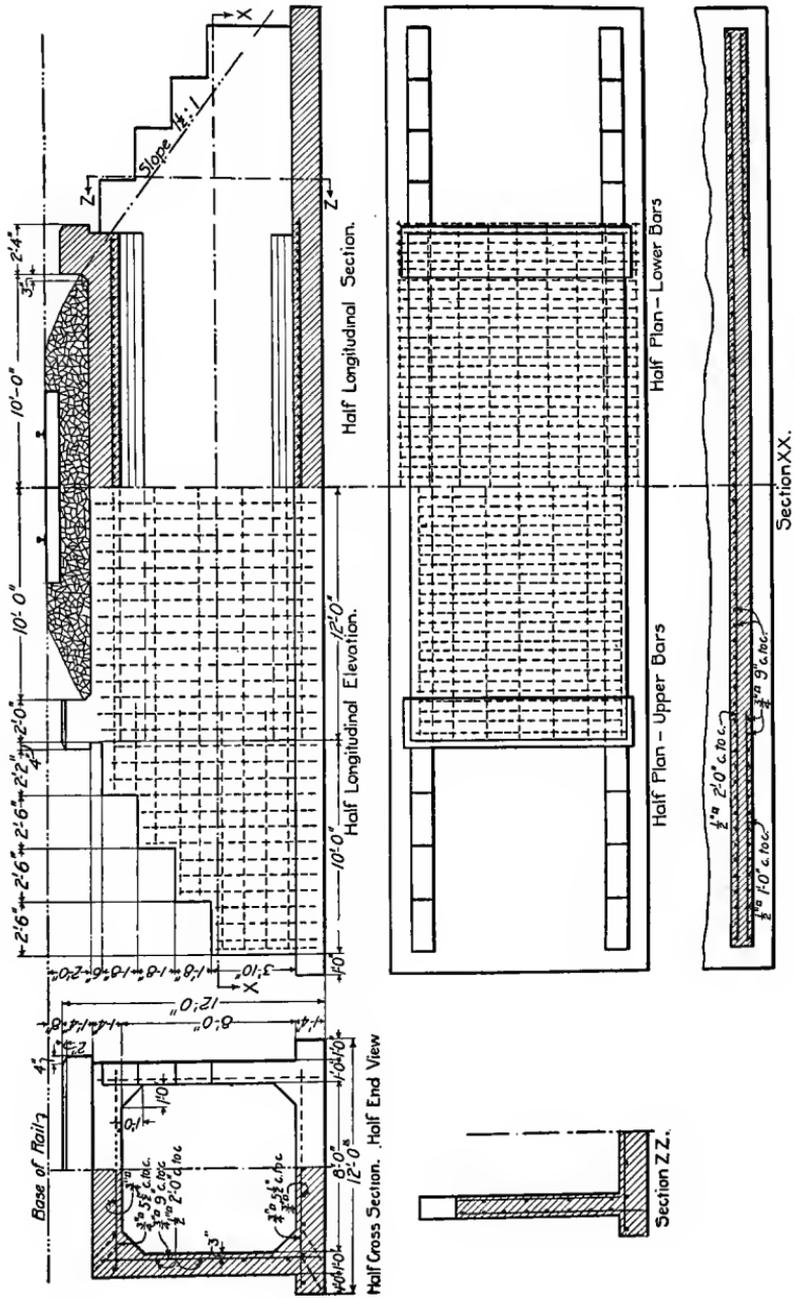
ILLINOIS CENTRAL REINFORCED CONCRETE BOX CULVERT.
